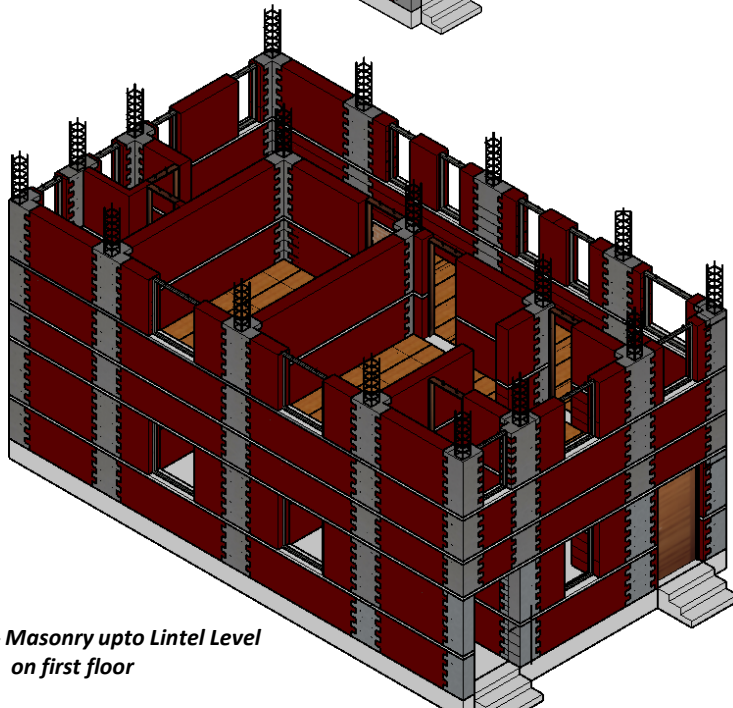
Masonry upto Lintel Level on first floor
